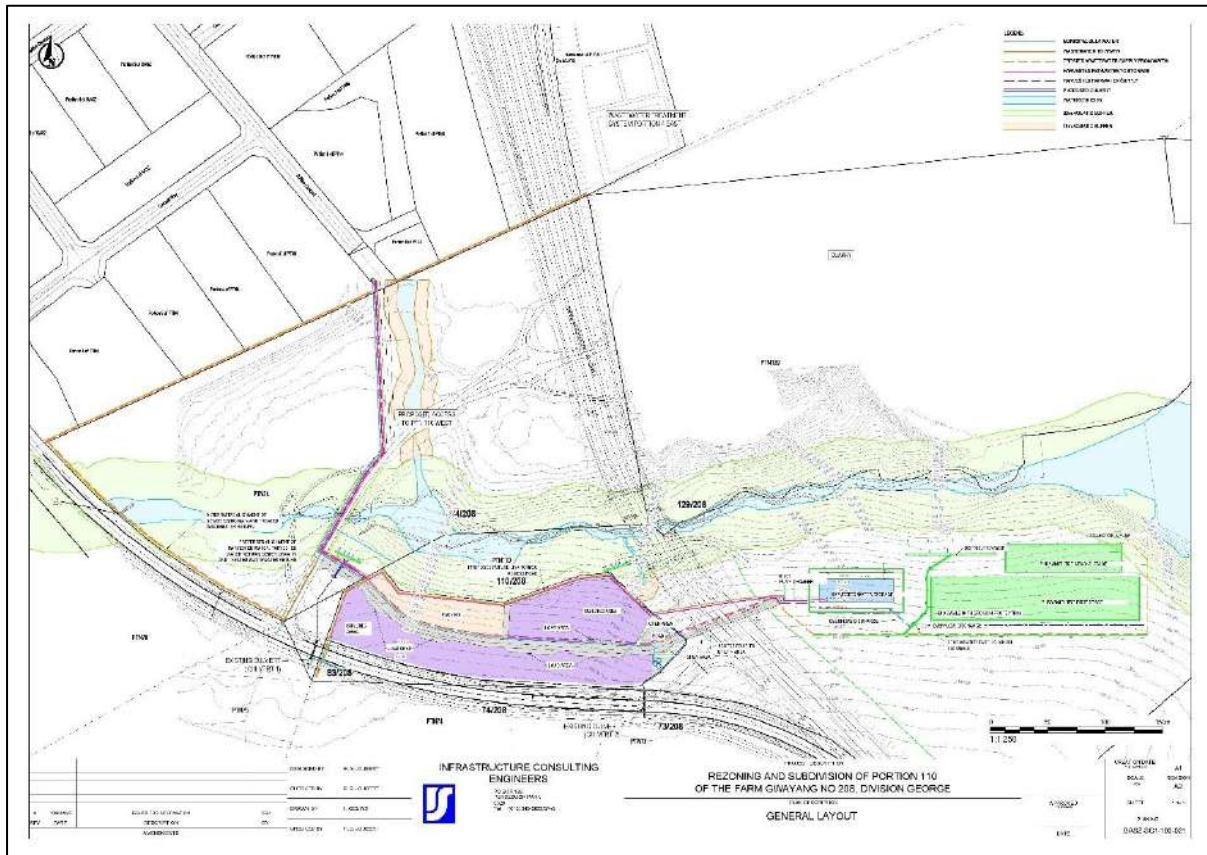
Site Development Plan No. GASZ-SC1-100-021 (Infrastructure Consulting Engineers, 2025).
